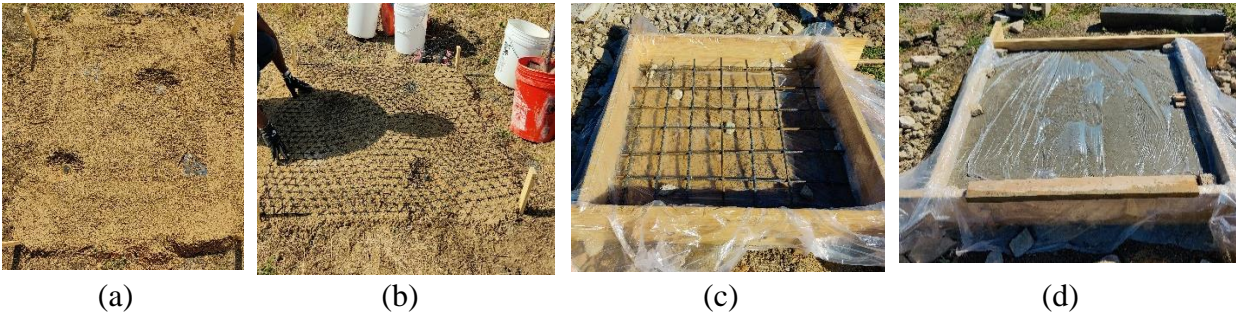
Construction of load transferring platform on top of RPP groups (a) leveled surface with sand (b) Geo-grid placement (c) Rebar cage placed in the formwork with 2.54 mm cover, and (d) Completed LTP
